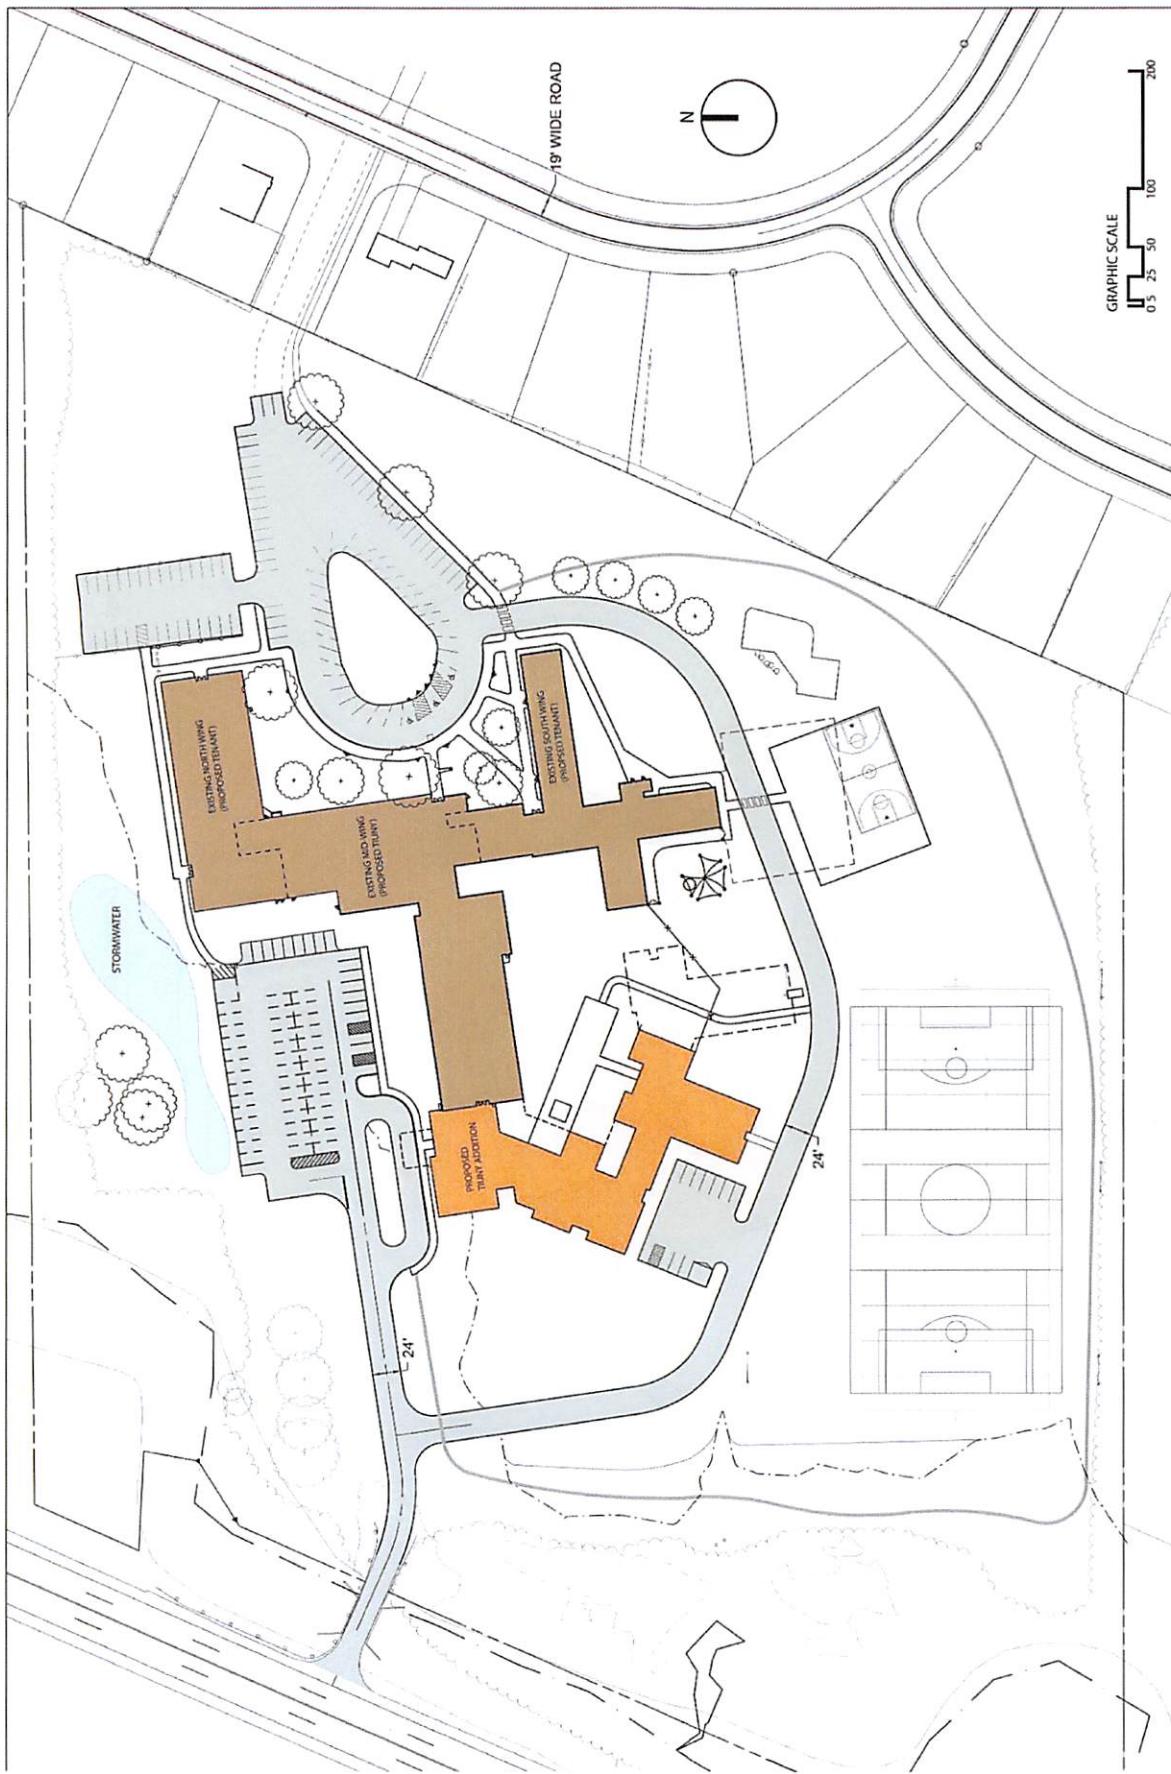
Proposal to close the Idlewood vehicle entrance and add a connecting driveway to the south of the building
